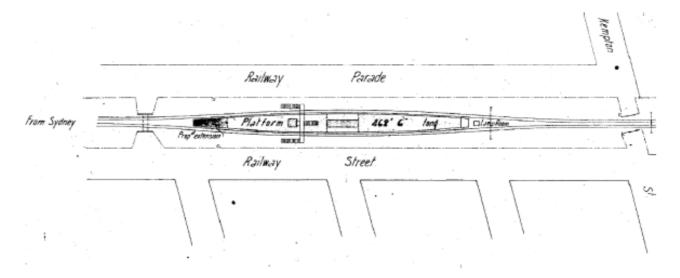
Plan of Banksia Station in 1906 (Source: Sydney Trains plan room)
